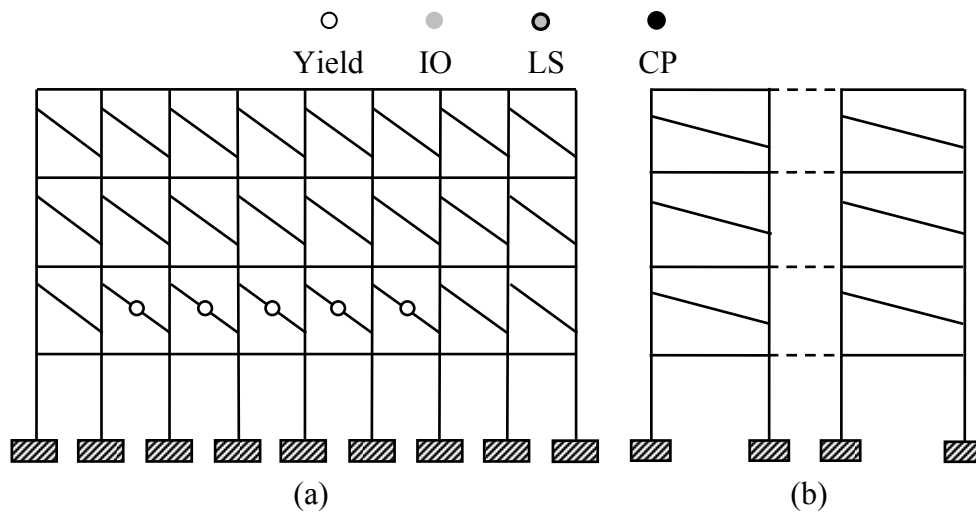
Hinge pattern at performance point for DBE of four storey RC infilled frame buildings with open ground storey, designed as SMRF considering provisions of BIS (2002) for open ground storey: (a) typical longitudinal frame; (b) typical transverse frame.
